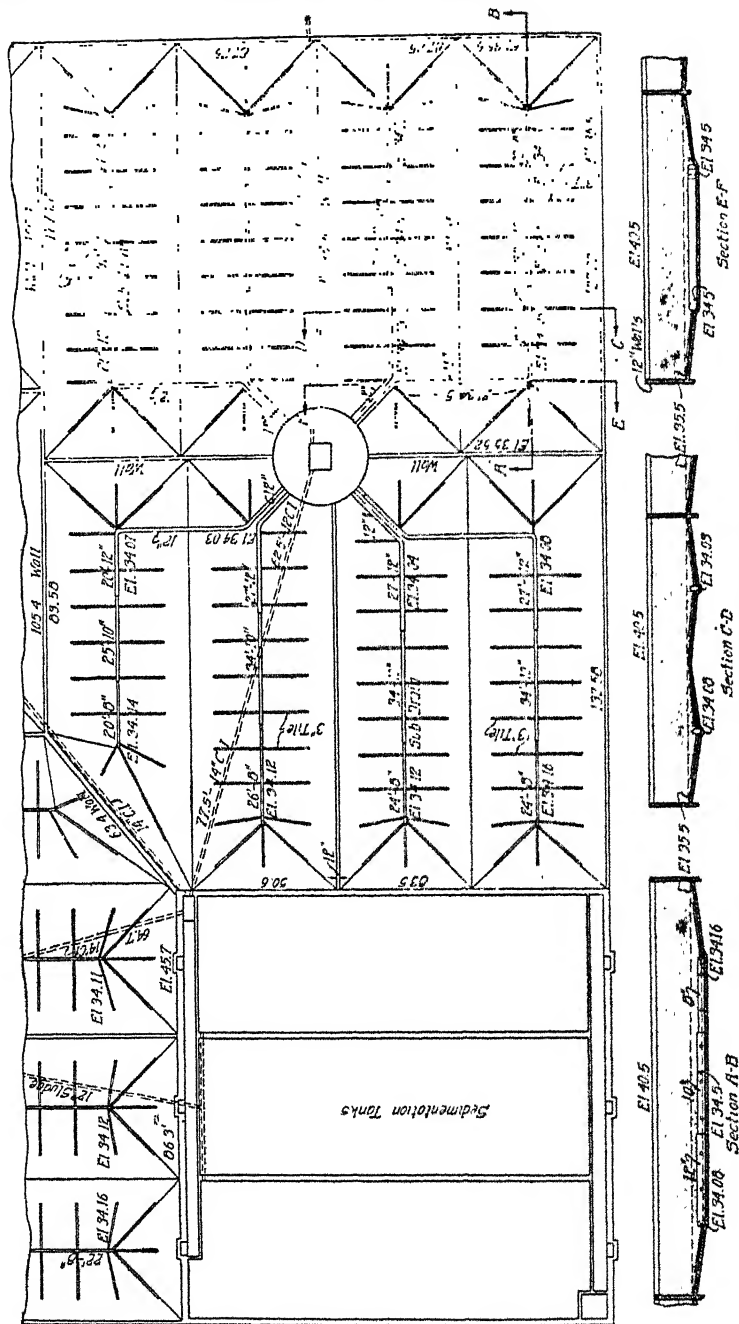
Plan and Sections of the Contact Beds at Alliance, Ohio
